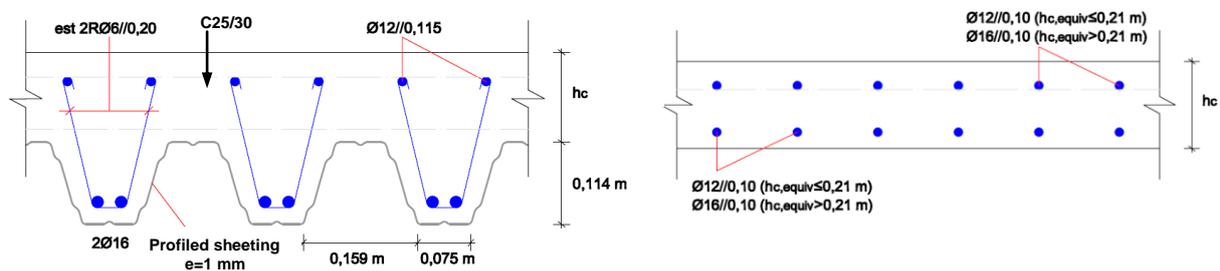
Transverse section considered for strength evaluation: θ direction (in the left); x direction (in the right).
